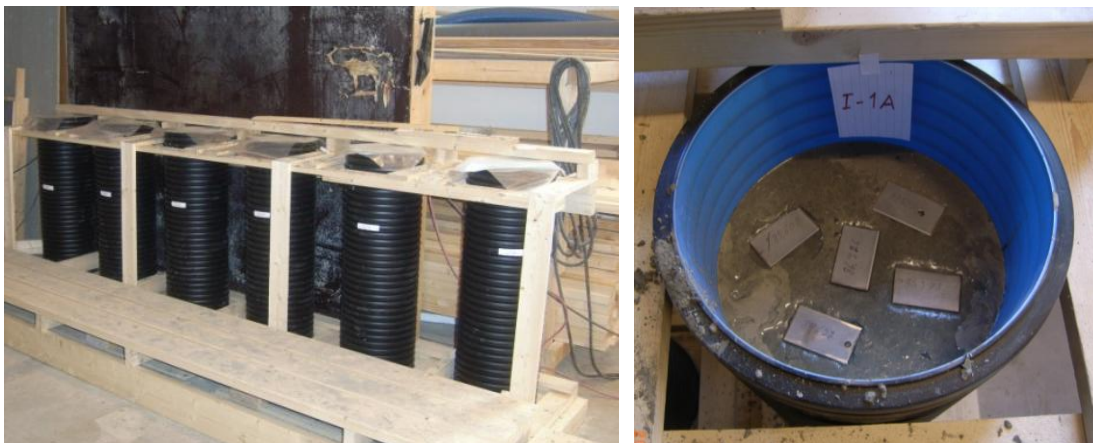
The sewage pipes used as moulds for casting of the concrete cylinders (left image) and the interior of the mould during casting of concrete cylinders containing stainless-steel objects (right image).
